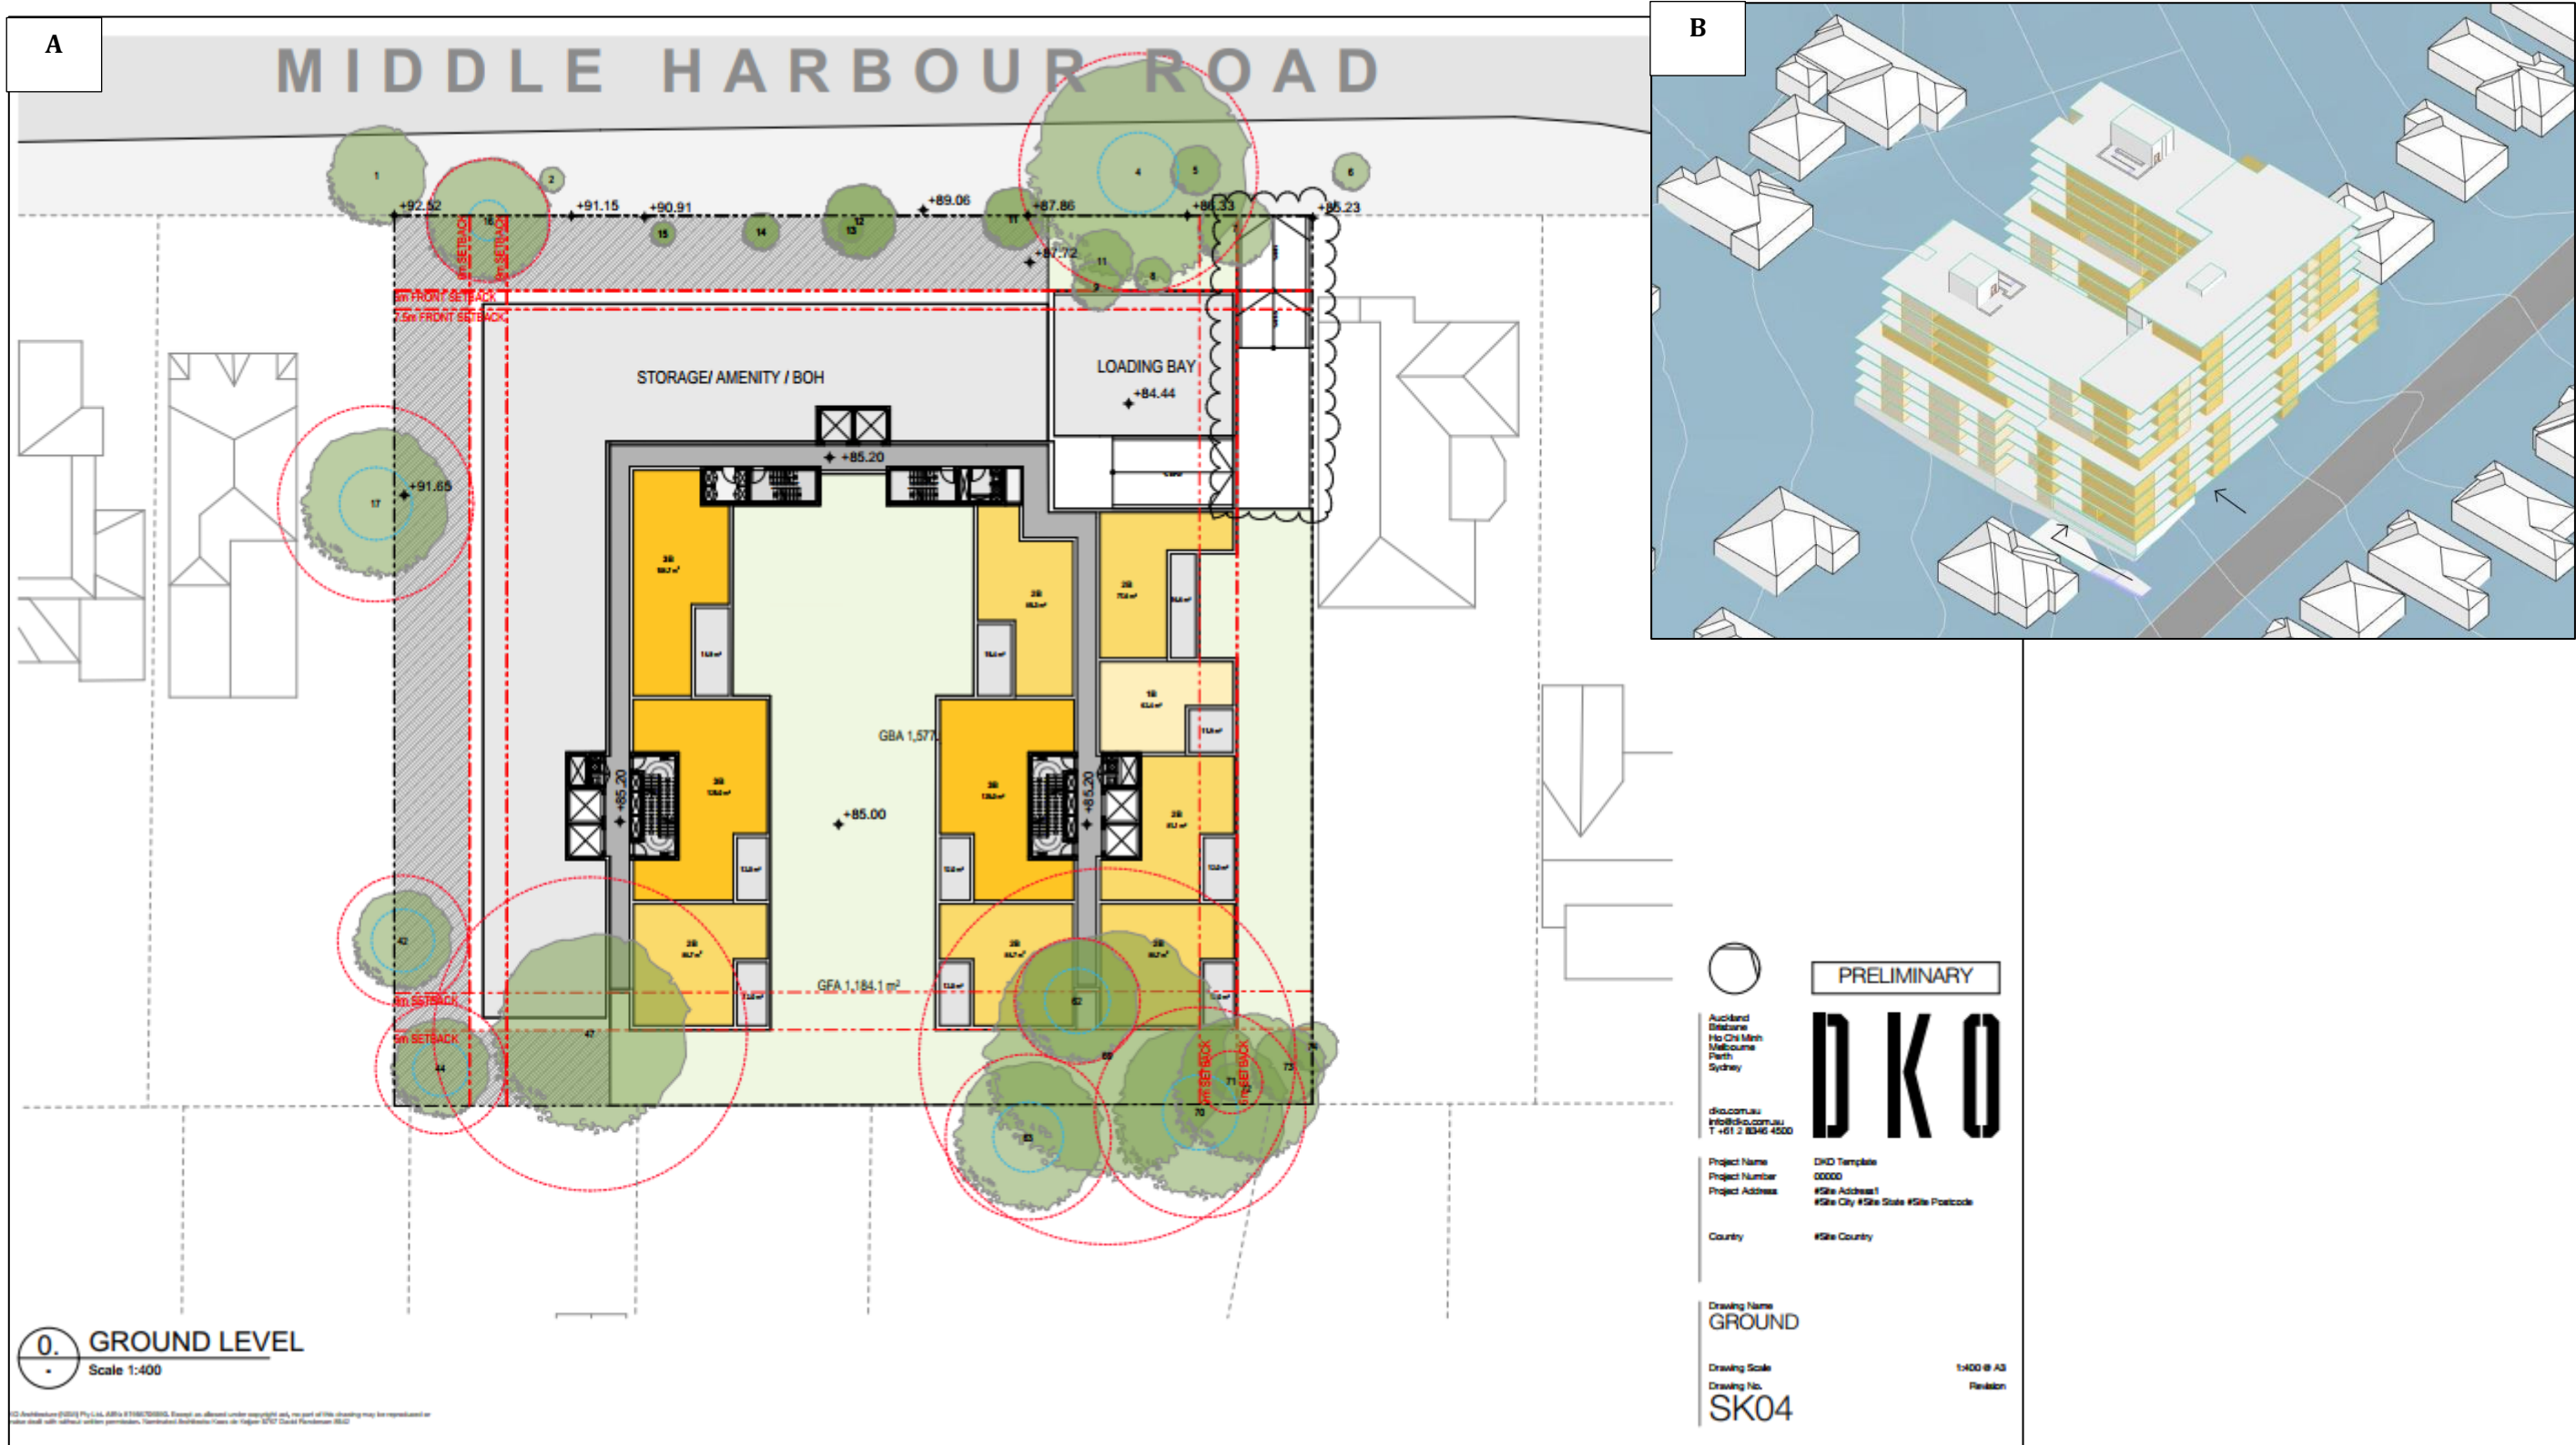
Preliminary site plan of Ground Floor (A) showing the extent of the footprint and retained trees, and northern elevation (B).
